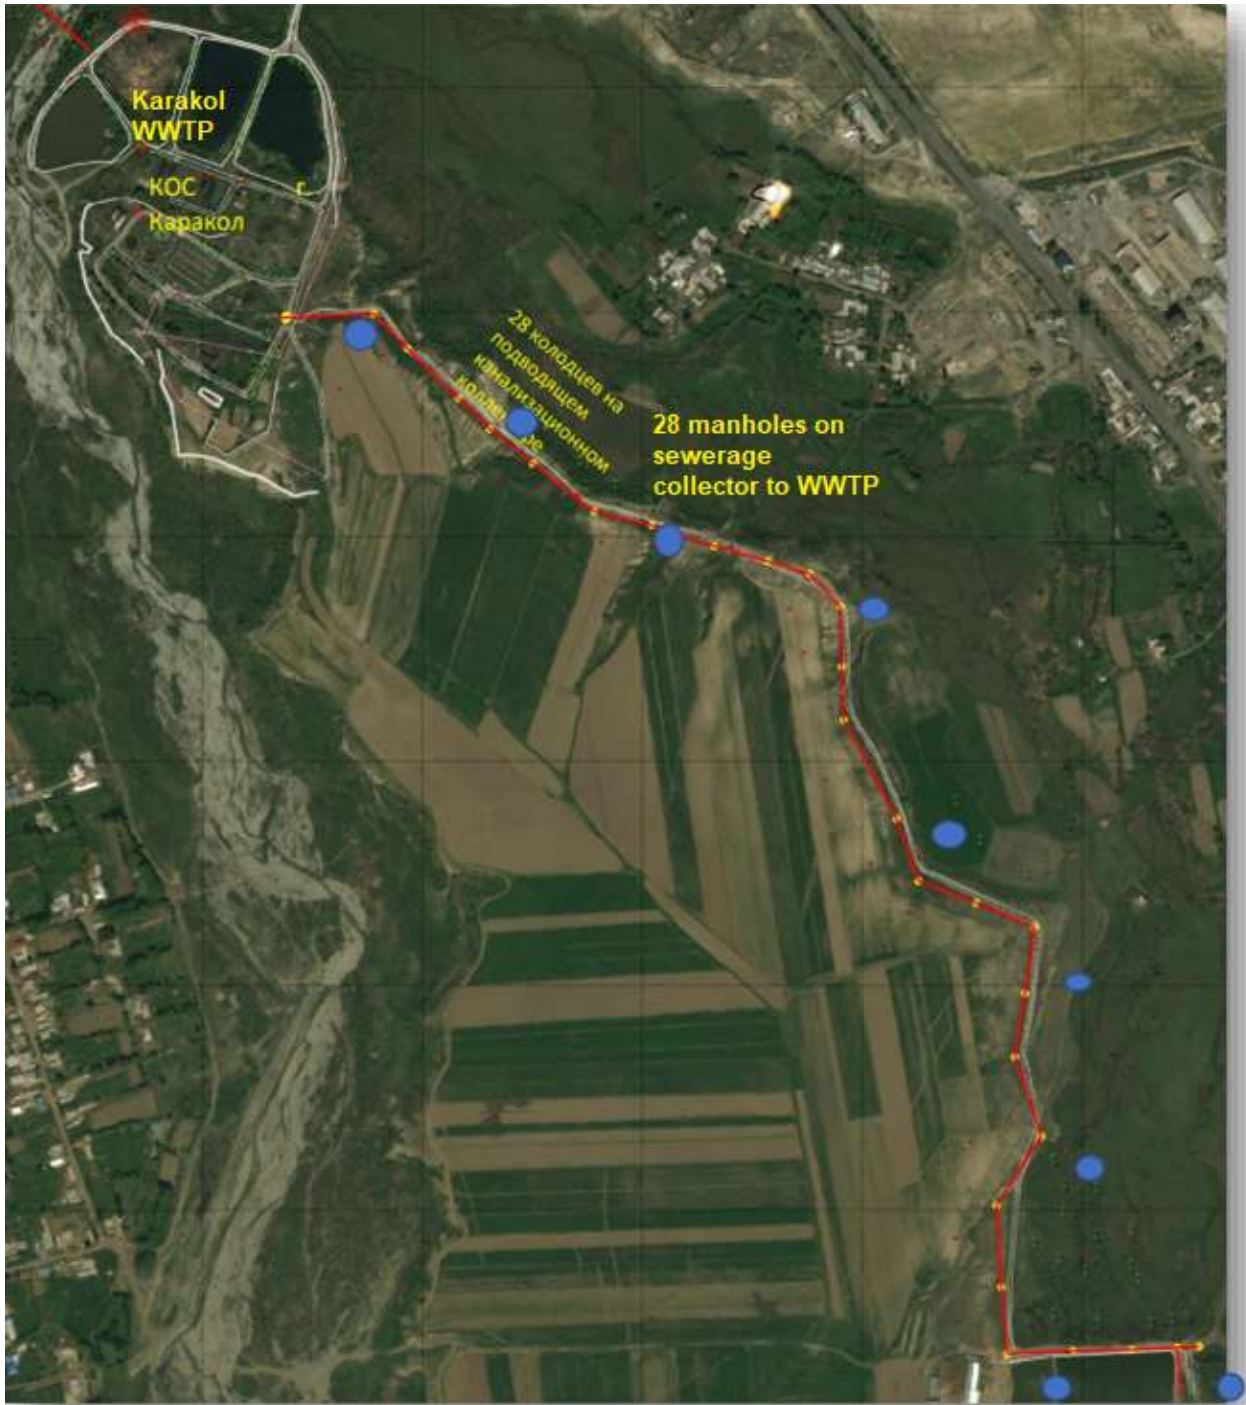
Elevating 28 Manholes on incoming collector to Karakol WWTP
